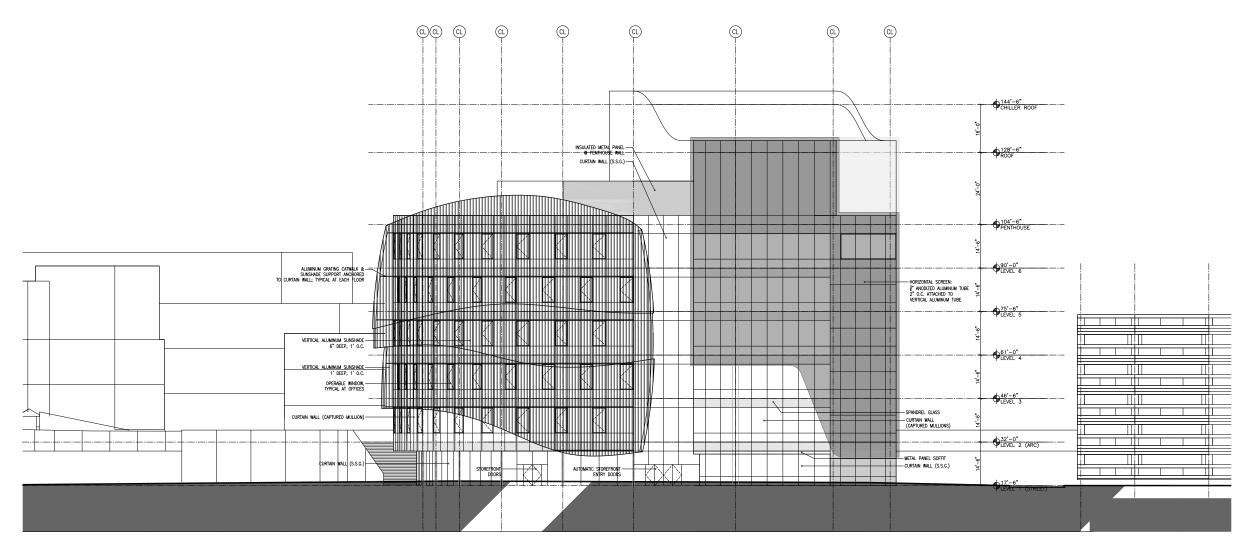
Building Elevation - SouthScale: 1/32" = 1'-0"
